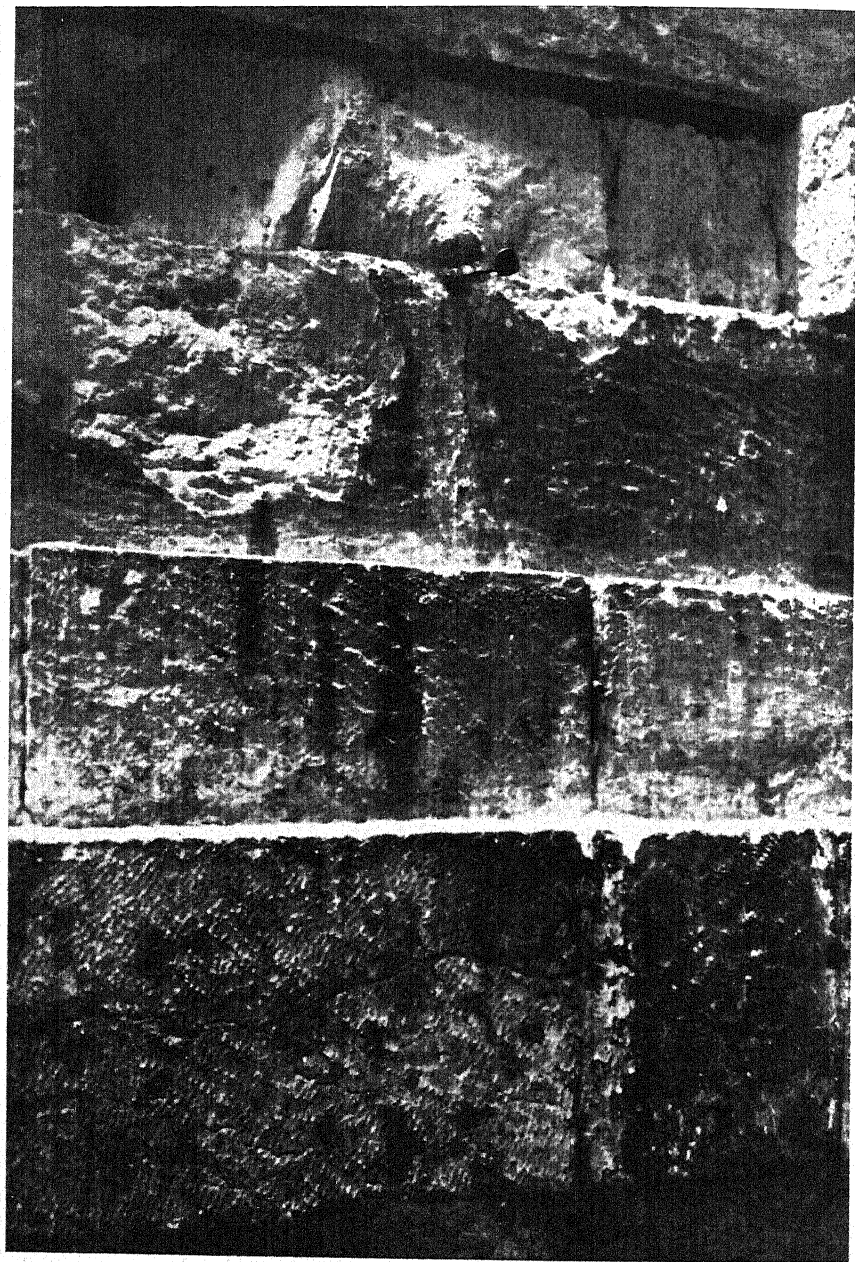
FRACTURES DUE TO RUSTING IRON CRAMPS.
